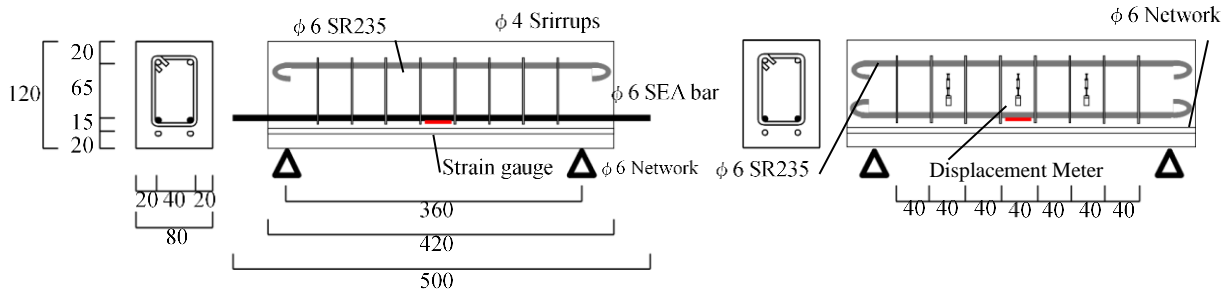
SEA Beam and RC Beam Specimen Reinforcement Details
